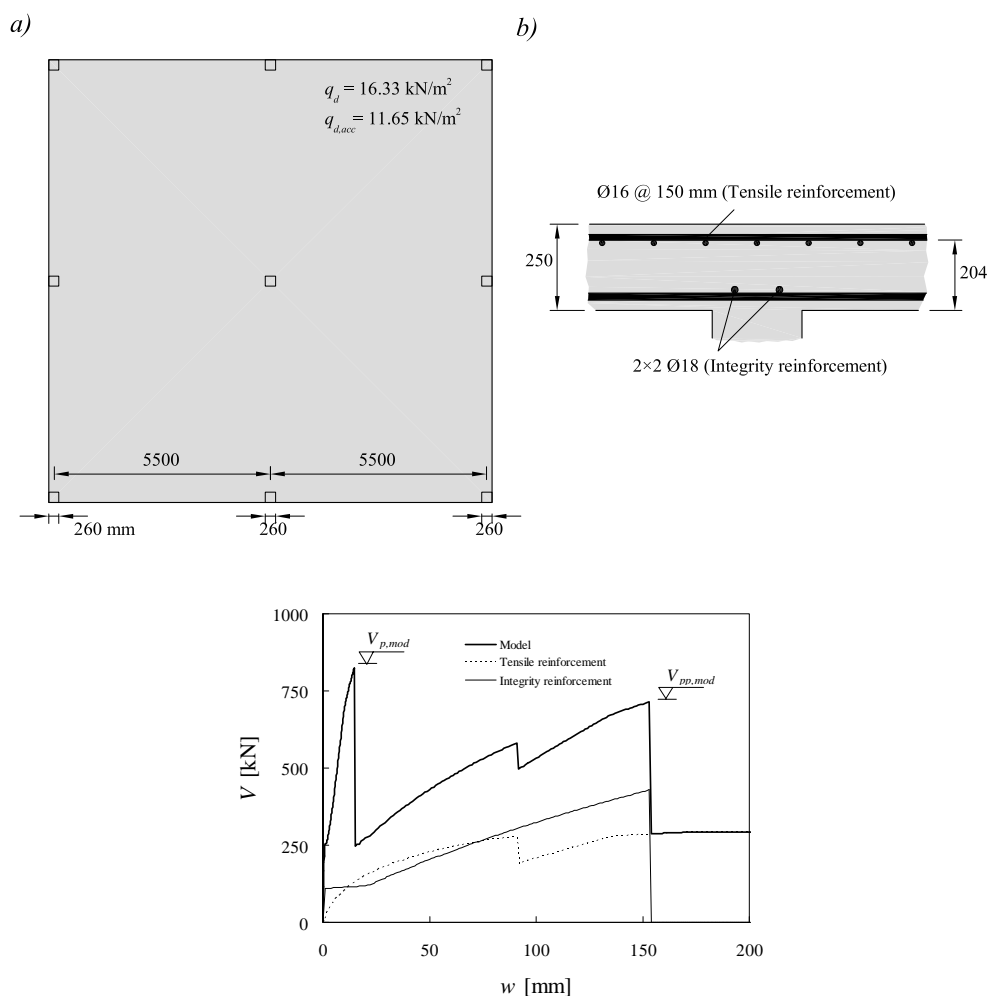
Nine column slab model: a) geometry and loading, b) reinforcement arrangement over the column, and c) pre and post-punching behavior of the internal column
